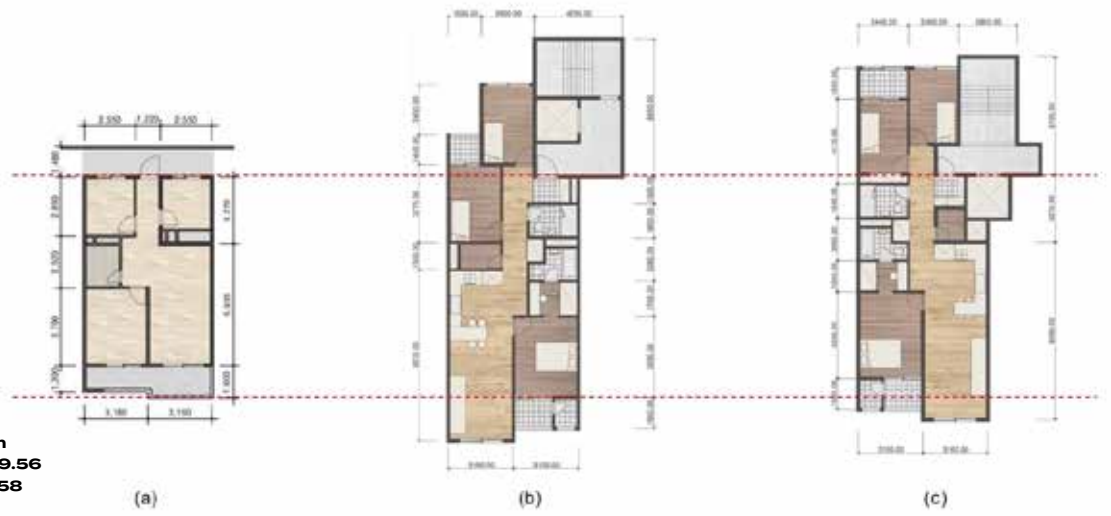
(a) Existing floor plan (58.14 m²), (b) alternative 1 (69.56 m²), and (c) alternative 2 (69.58 m²). Source: (Author 2018)
